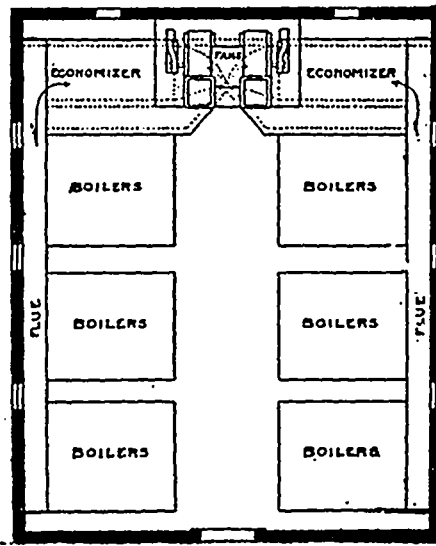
2400 H.P., BOILER PLANT EQUIPPED WITH MECHANICAL DRAFT.
